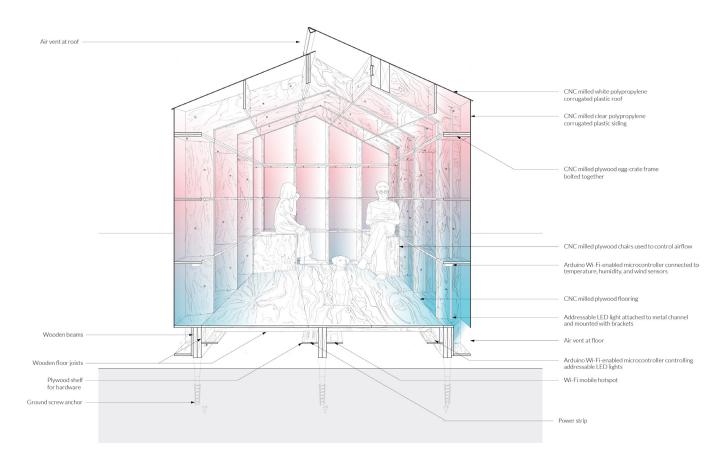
Section showing openings at the floor and along the roof ridge that induce natural ventilation flows within the space through a stackeffect. Drawing by authors.
